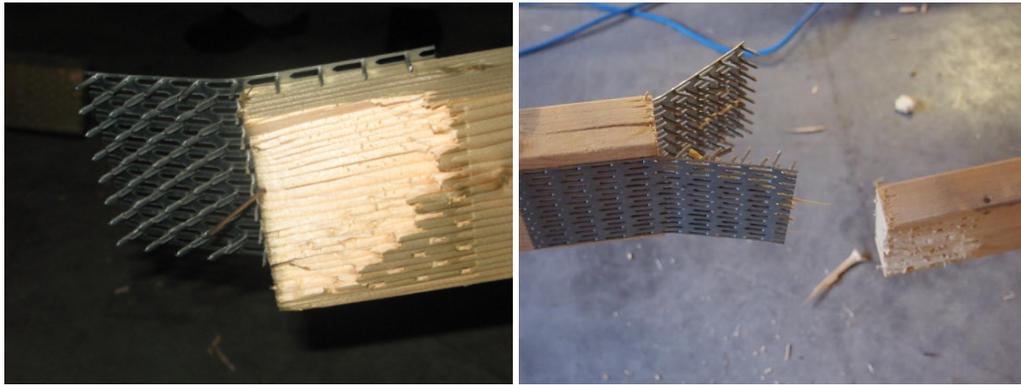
Damage of lower flange joint by original truss made of non sorted timber (left) and by new truss made of sorted timber.
